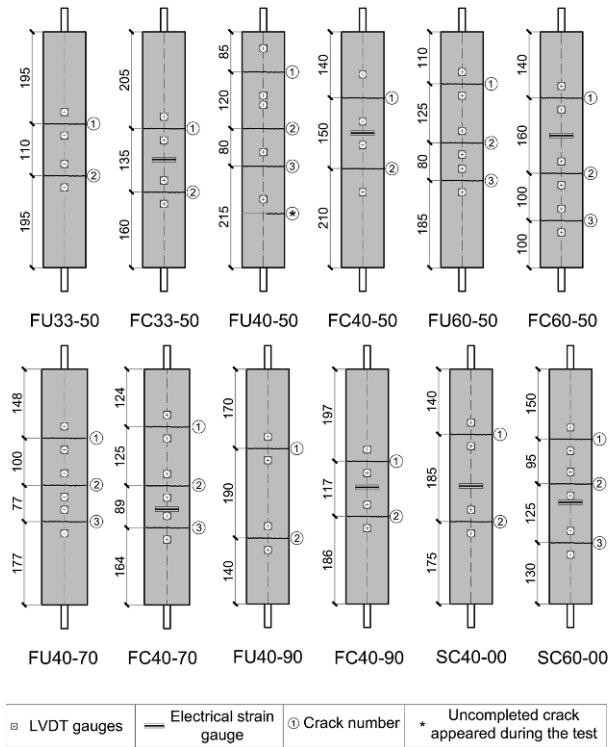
Test specimens, position of gauges, electrical strain gauges and transversal cracks
